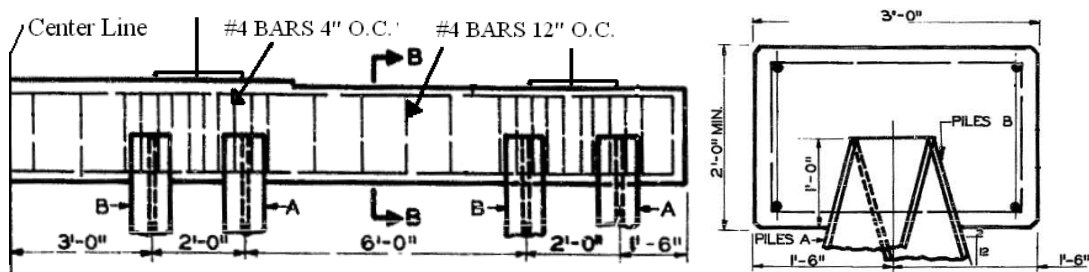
Pier Cap Elevation (left), Cross Section B-B(right) (Ref. GDOT Drawings)
